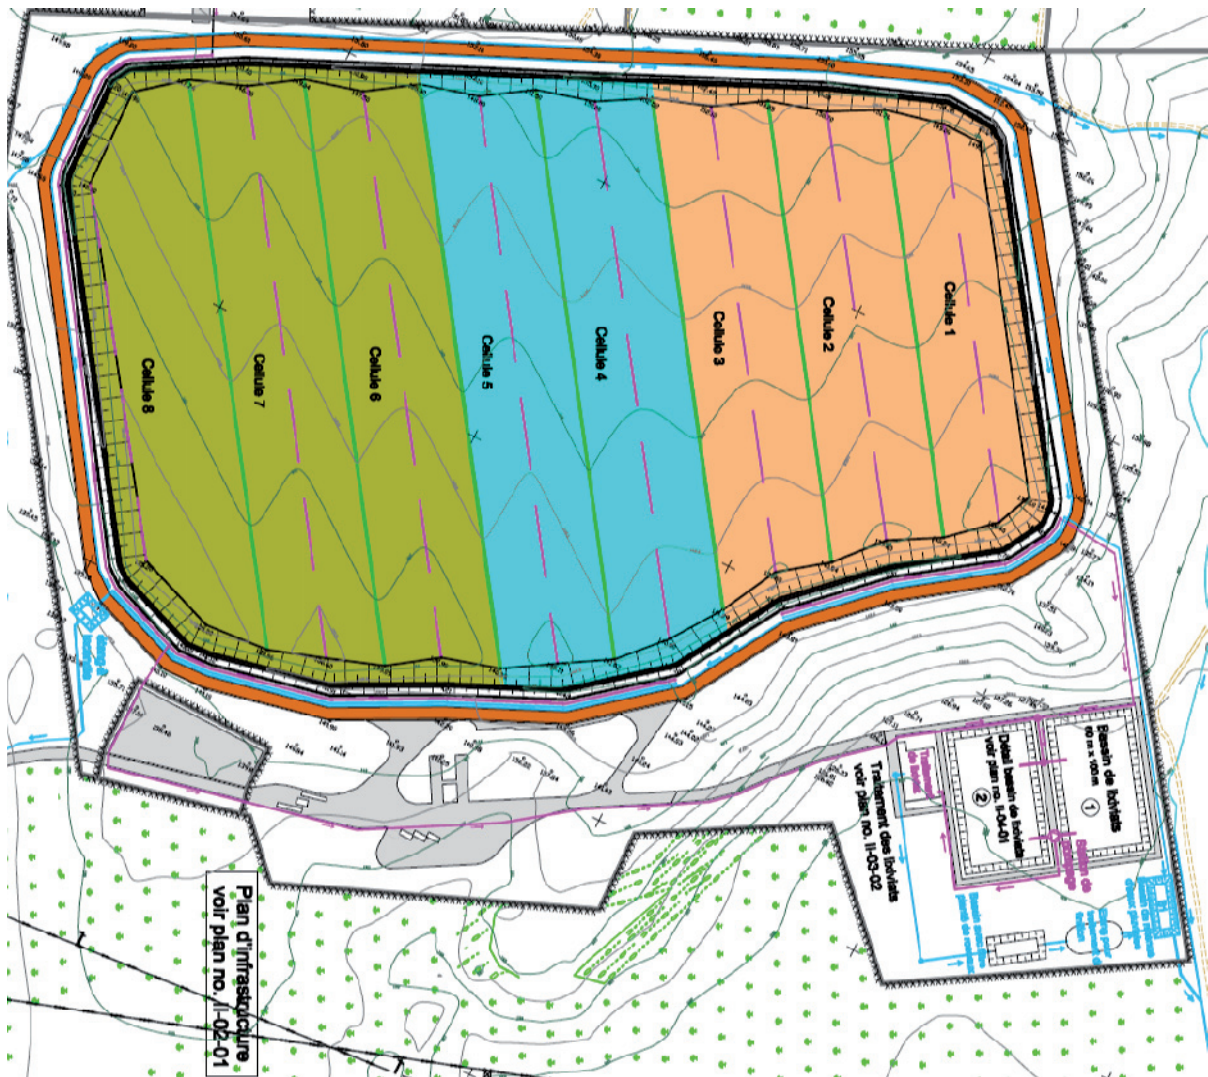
Layout of sanitary landfill „Kabouti“ /4/
